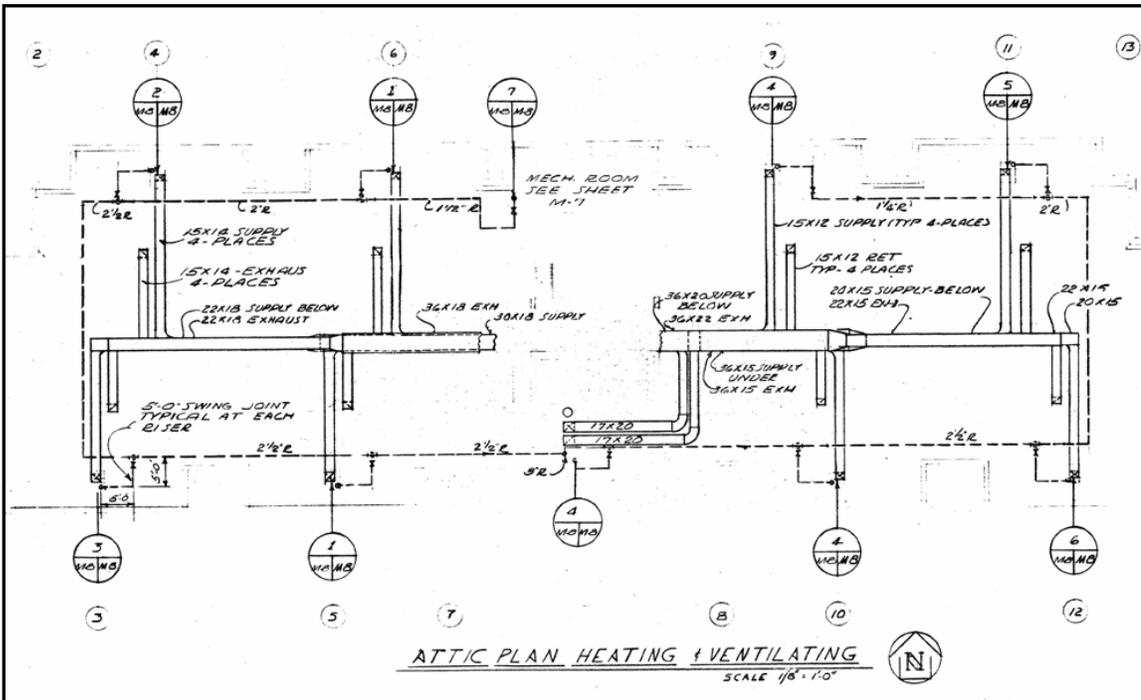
Bldg. 865 attic plan for ventilation ducts and hot water heating distribution loop.
